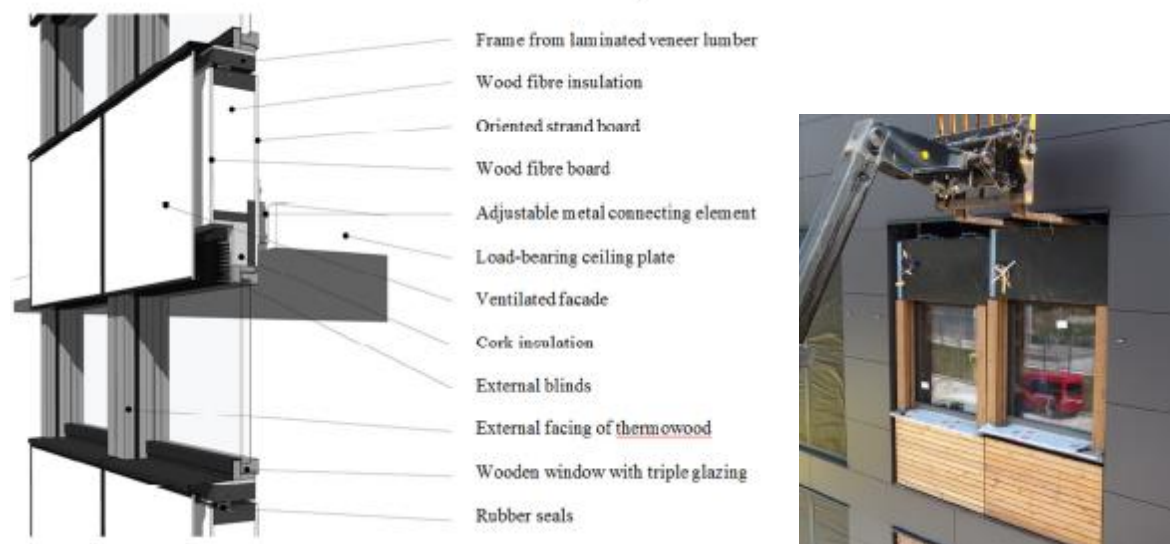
Scheme and photo of wood-based curtain wall (source: Tywoniak et al. (2014))
